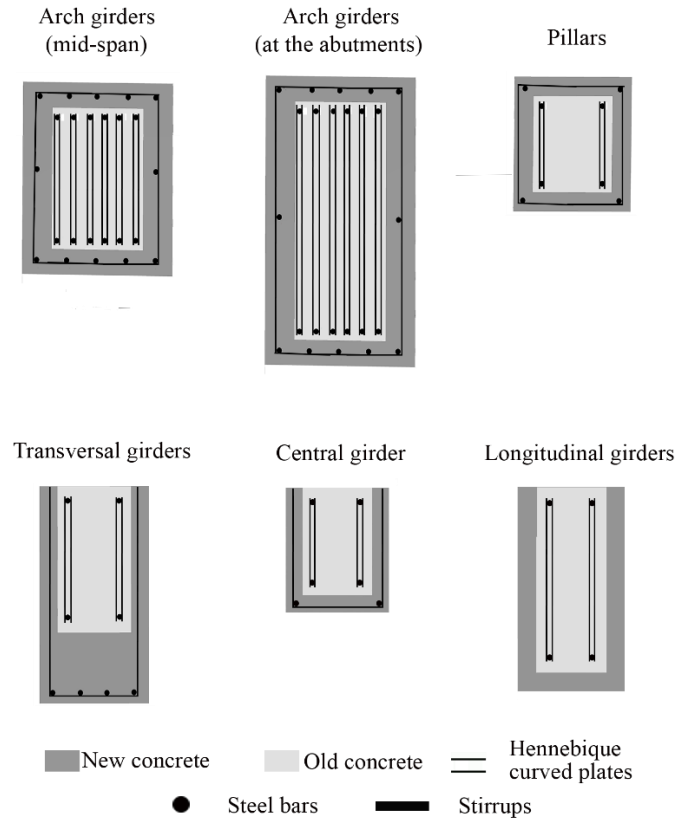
Cross-sections with concrete layers and reinforcement (steel bars, stirrups and Hennenbique curved plates) of the structural components. Adopted from [7].
